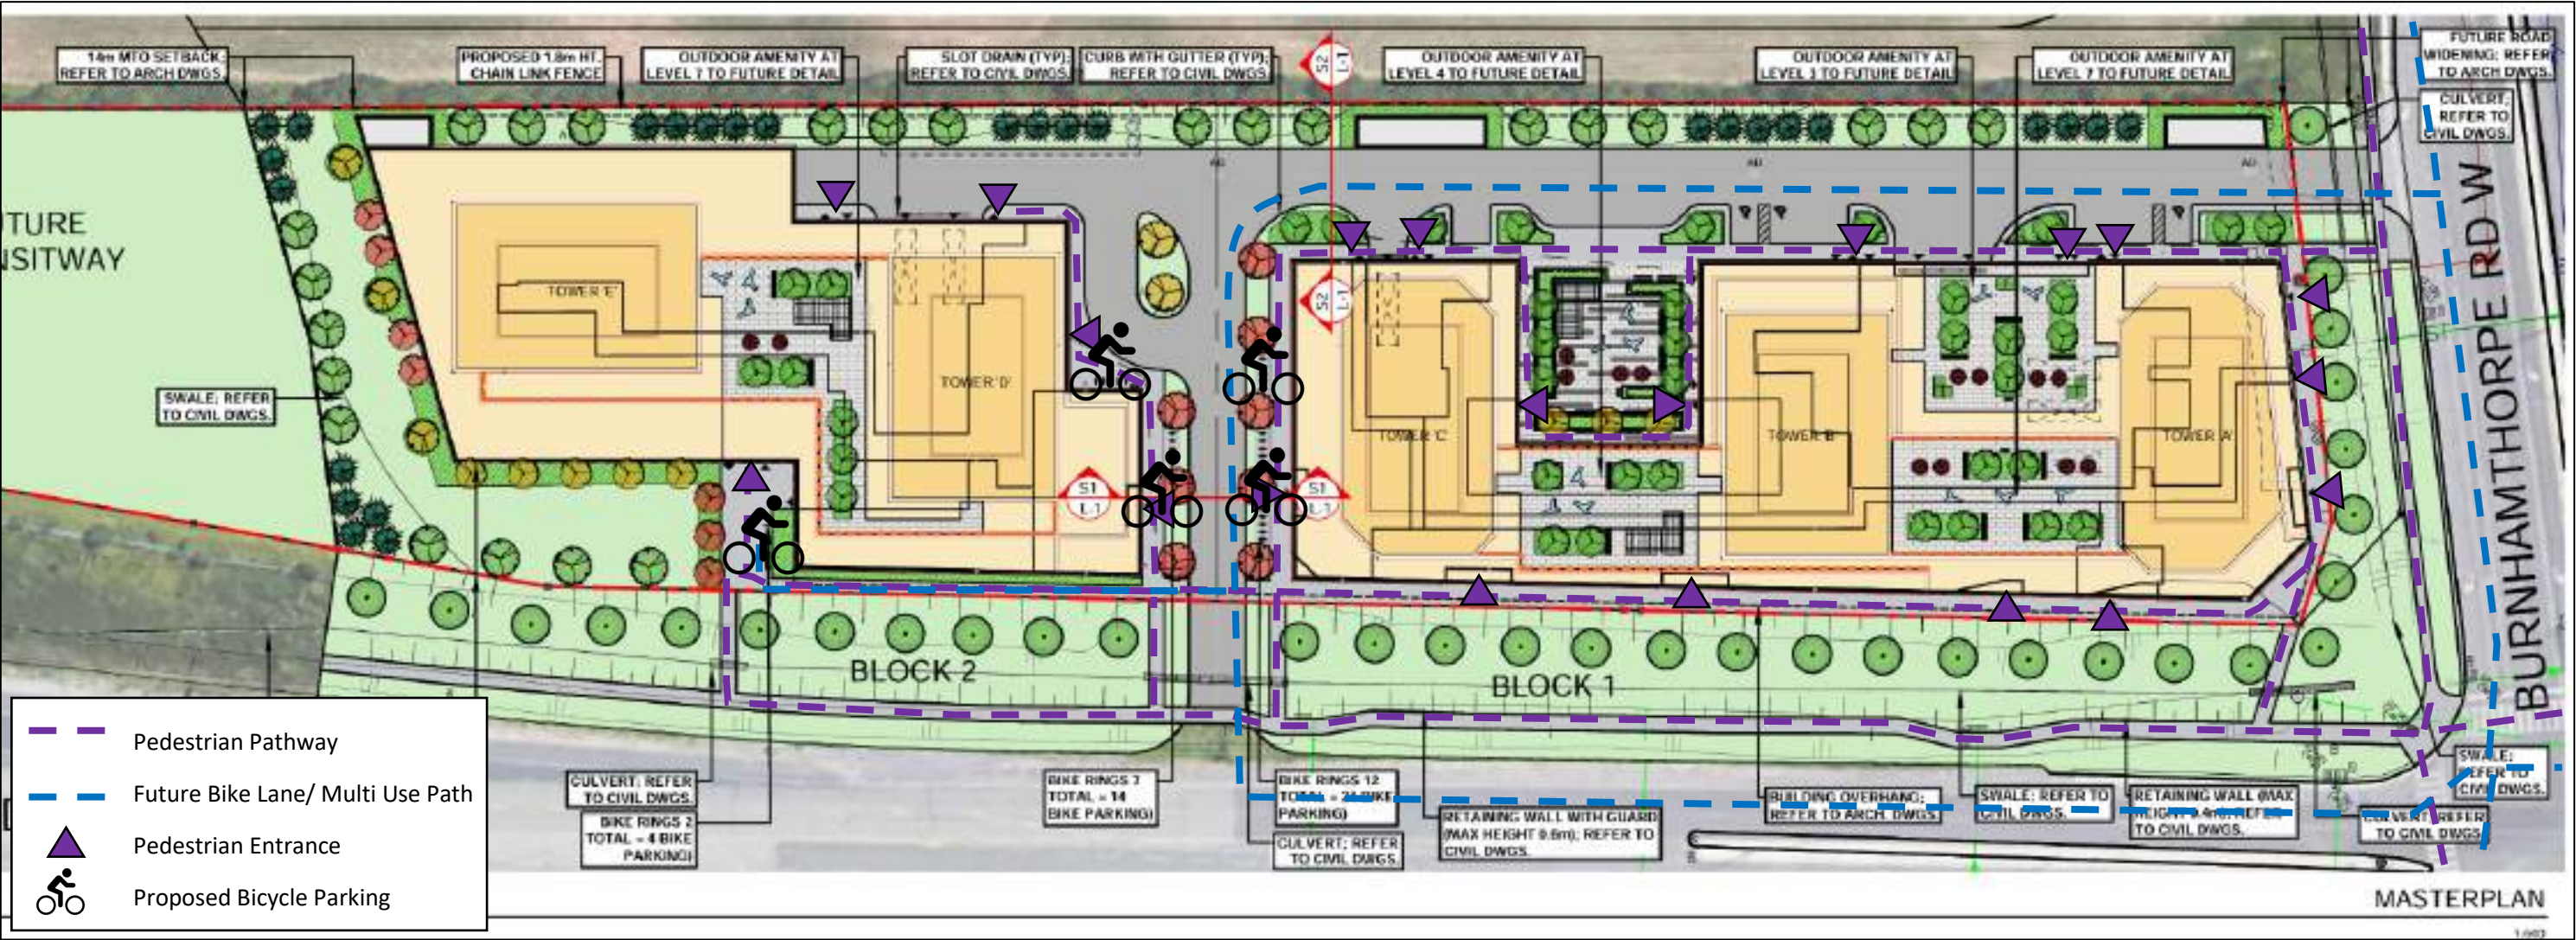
Proposed Landscape Plan and Pedestrian Circulation Plan
